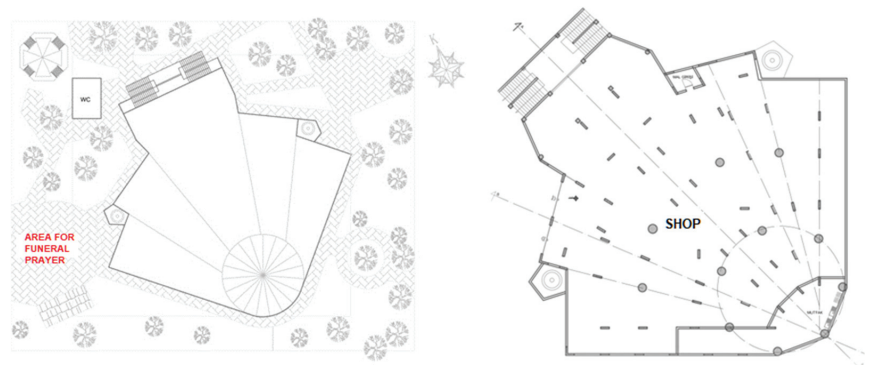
The Akdeniz Sanayi Mosque’s layout and ground floor plan.
